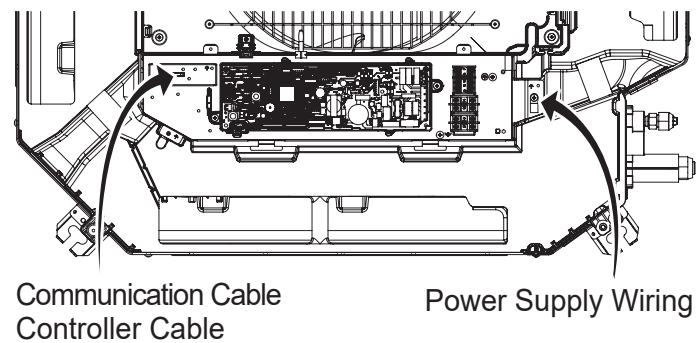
3' x 3' TB Frame Four-Way Cassette Wiring / Cable Routing, Side View.
